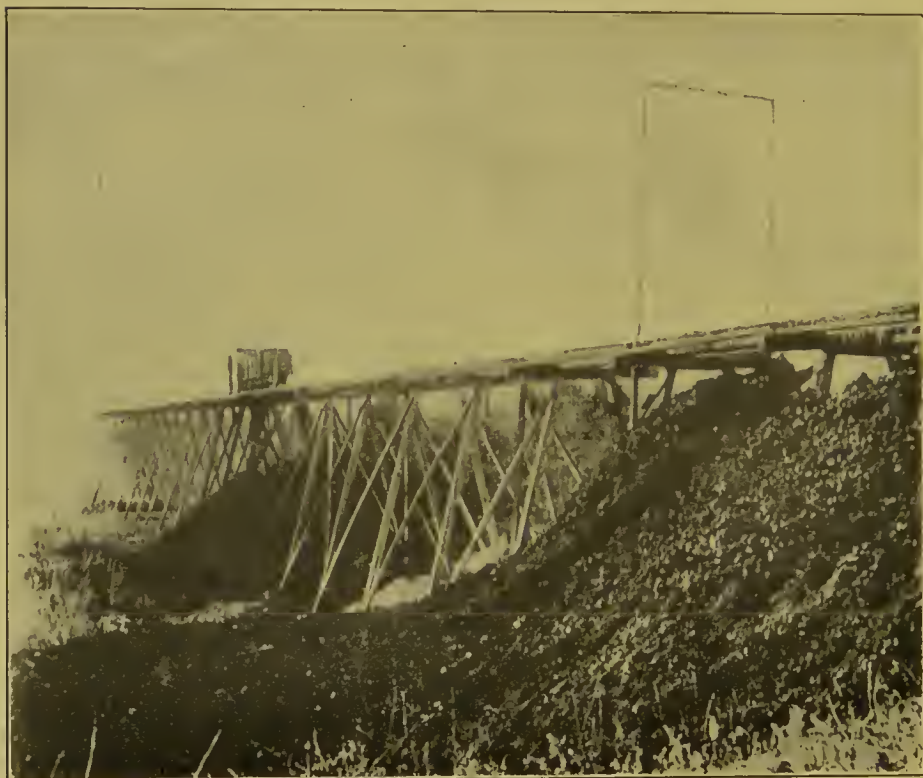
Dumping Pressed Sludge, Worcester Sewage Works.
